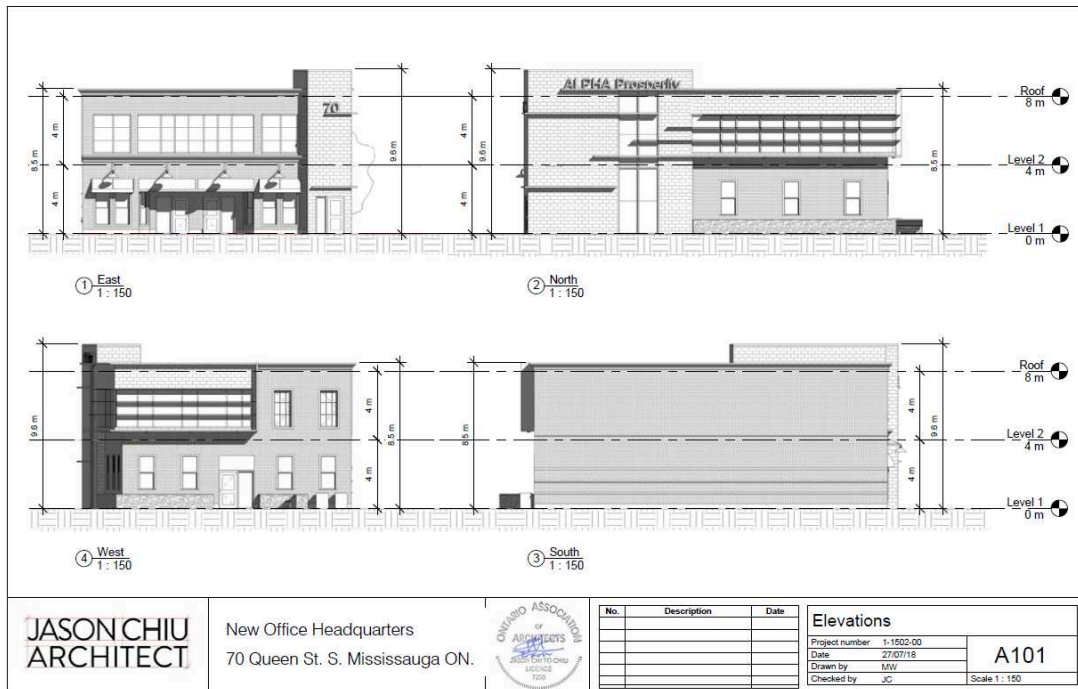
Elevations of the new development proposed for 70 Queen Street South. (Image from Alpha Prosperity Inc. 2018.)
